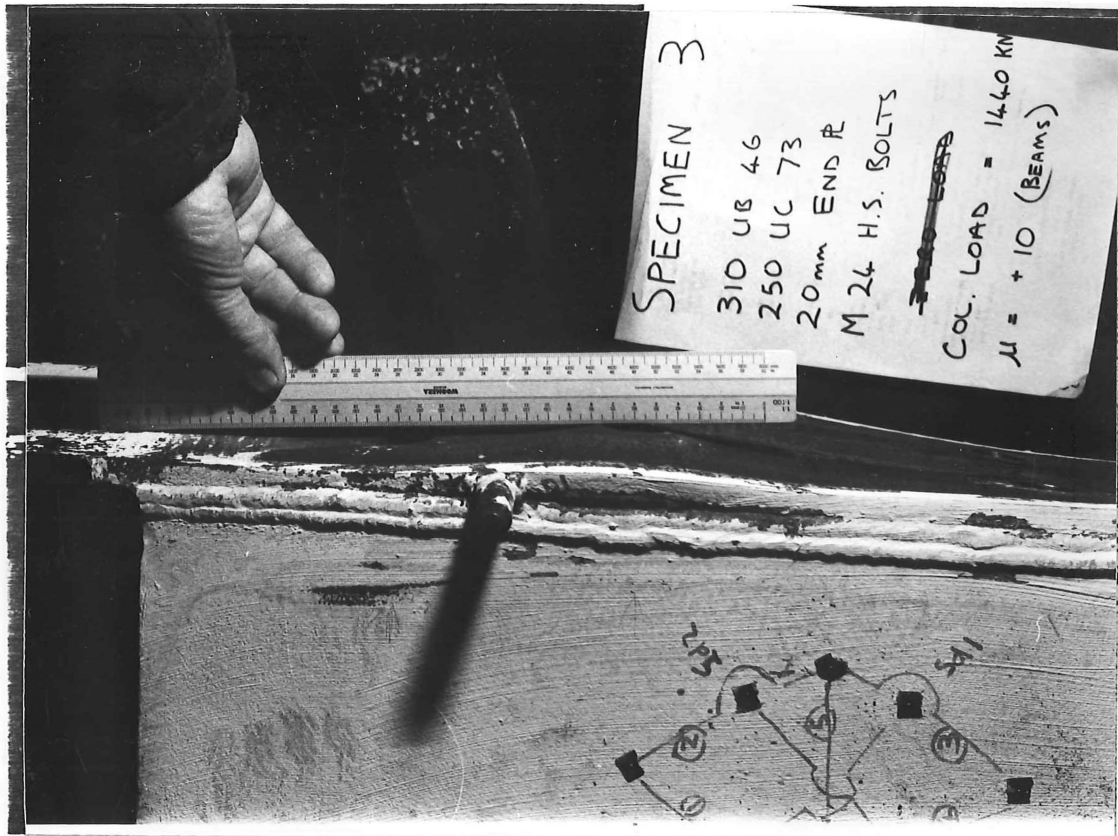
Deformation of the column flange on the beam "B" side and partial fracture between the column flange and doubler plate butt weld, specimen three.
